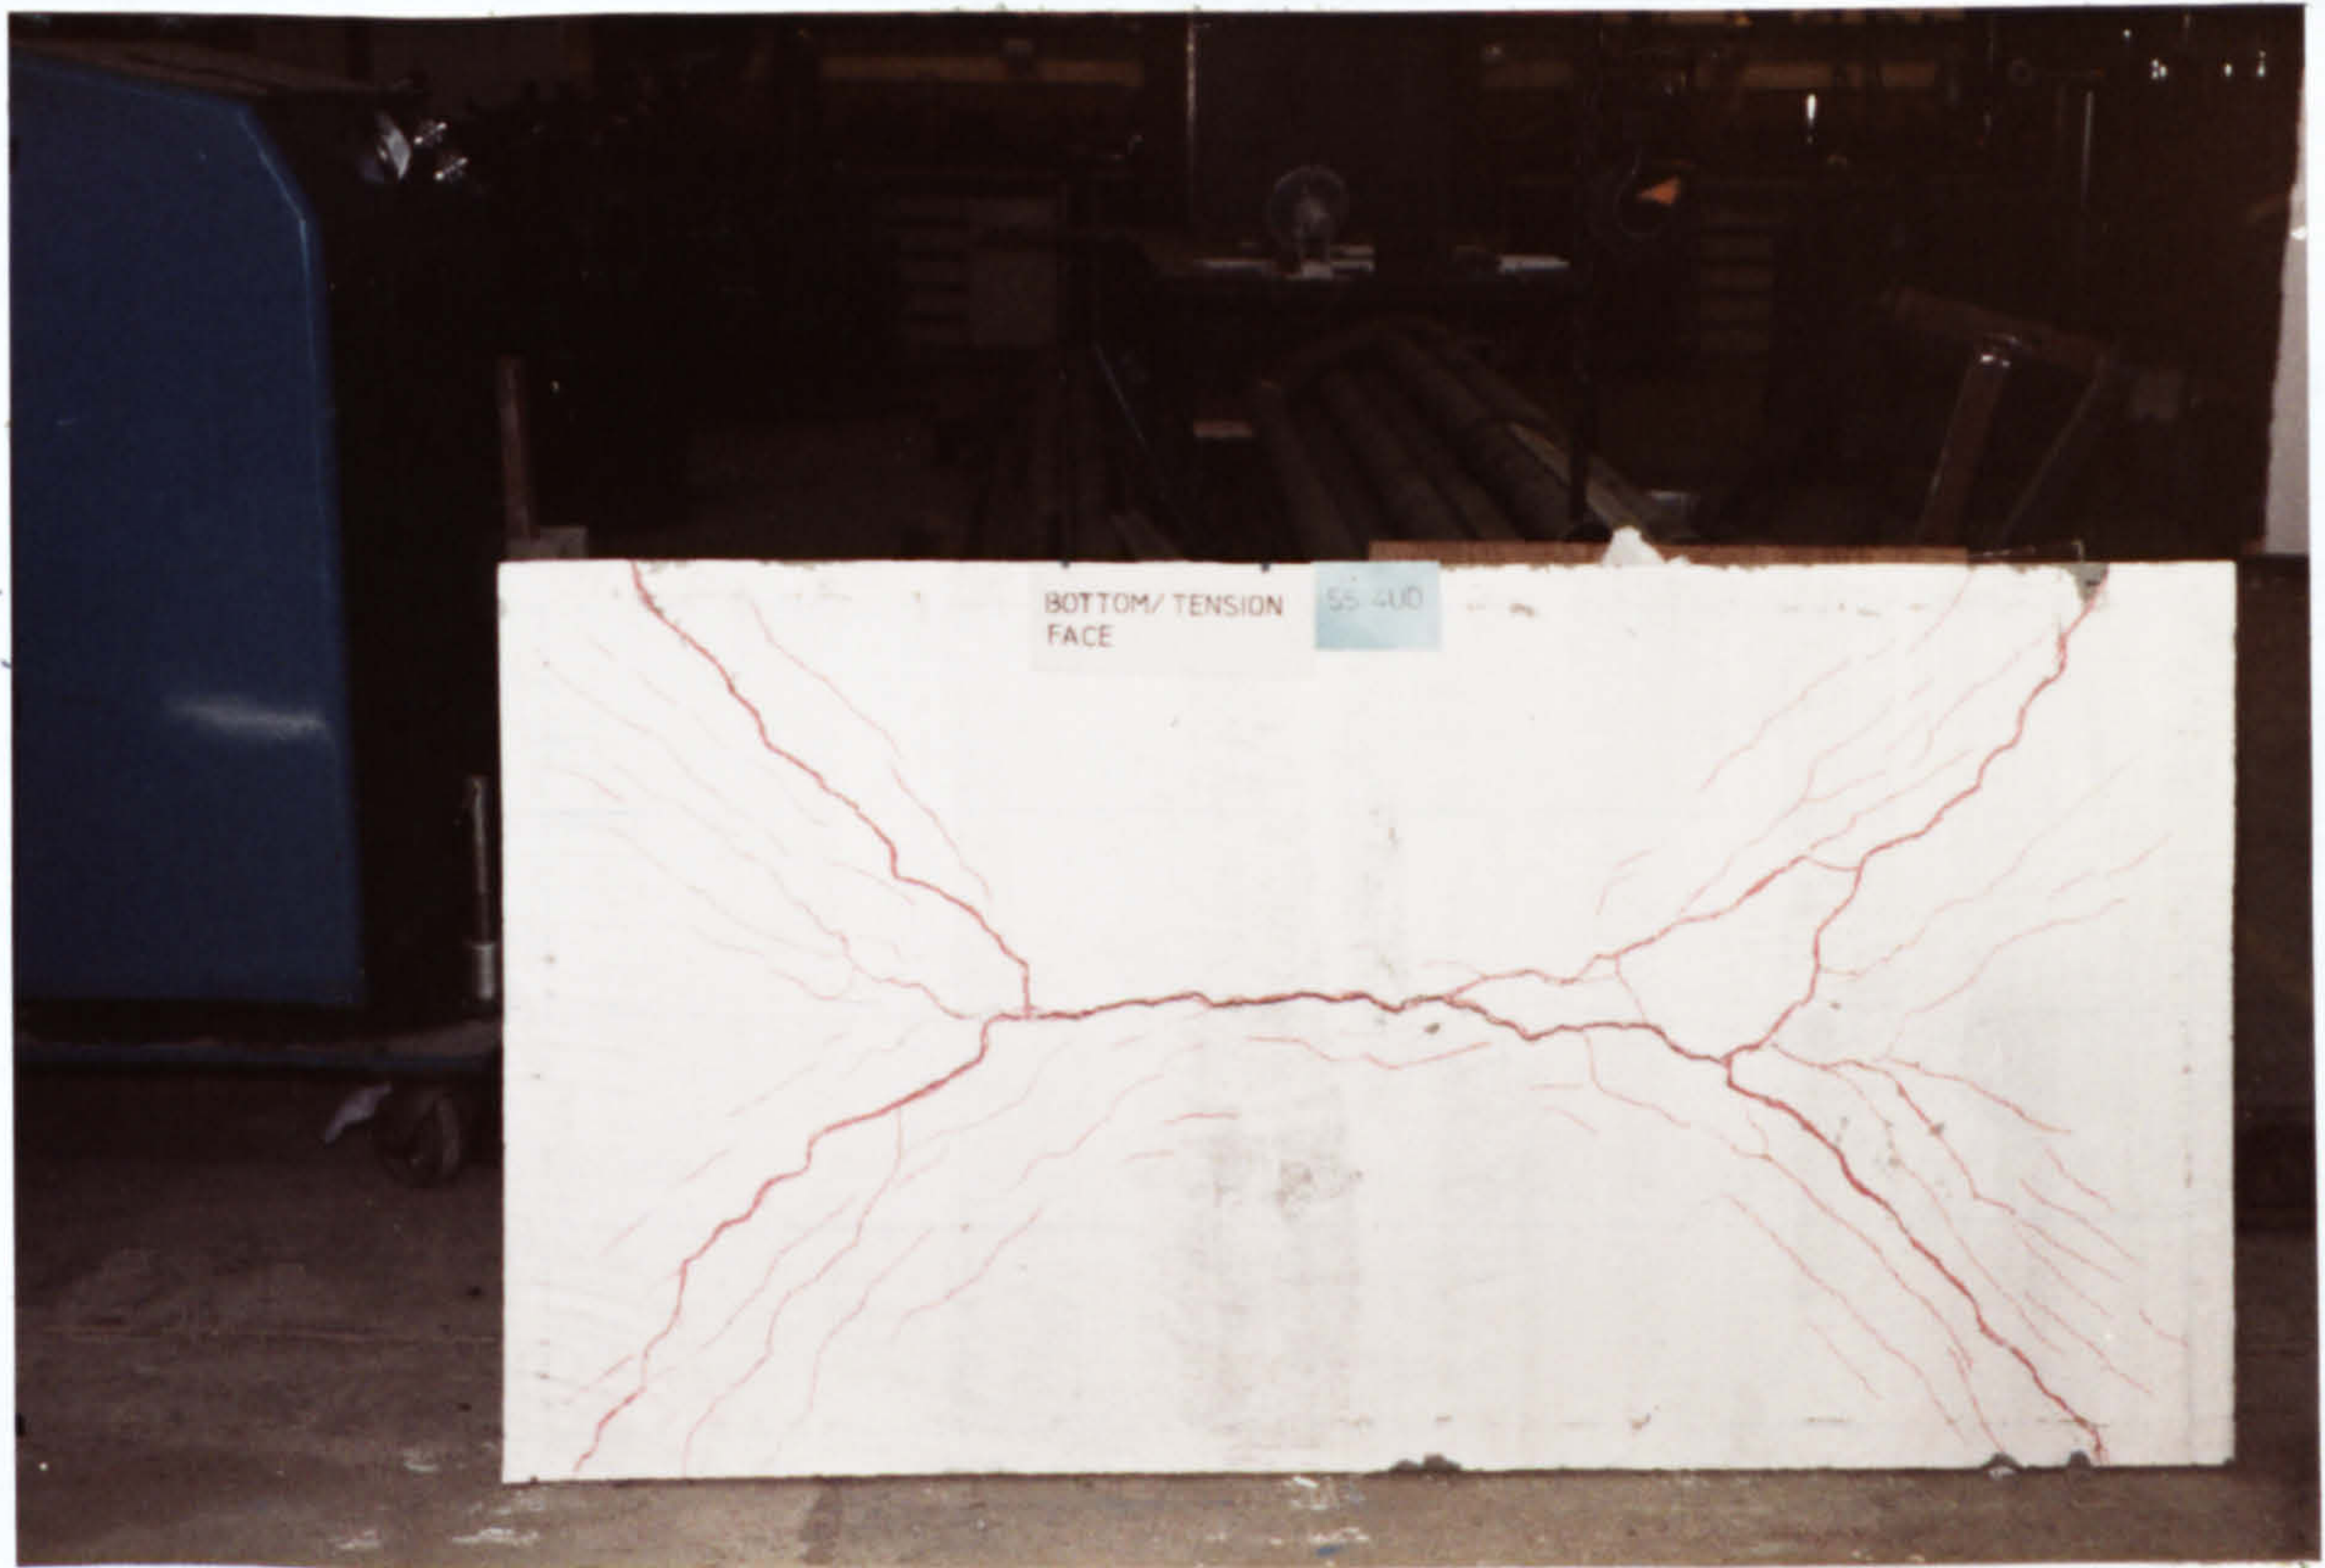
Crack Patterns at Failure on the Tension Face of Model S54UD.
